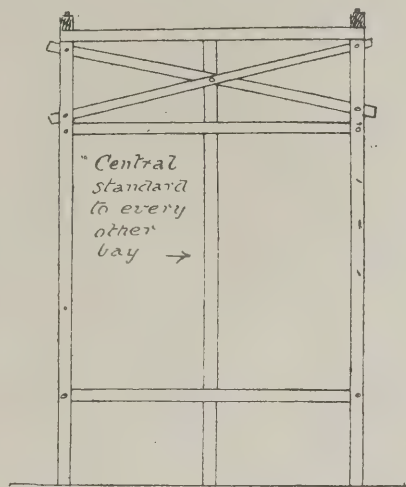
DERRICK STAGING TO CARRY TRAVELLING CRANE: END ELEVATION.
